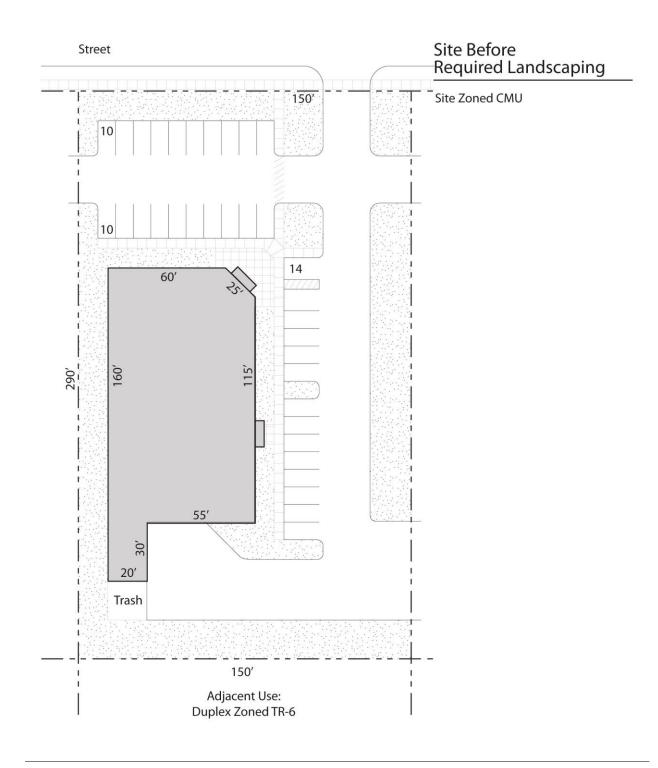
Sample Landscaping Schemes – Building Foundation
